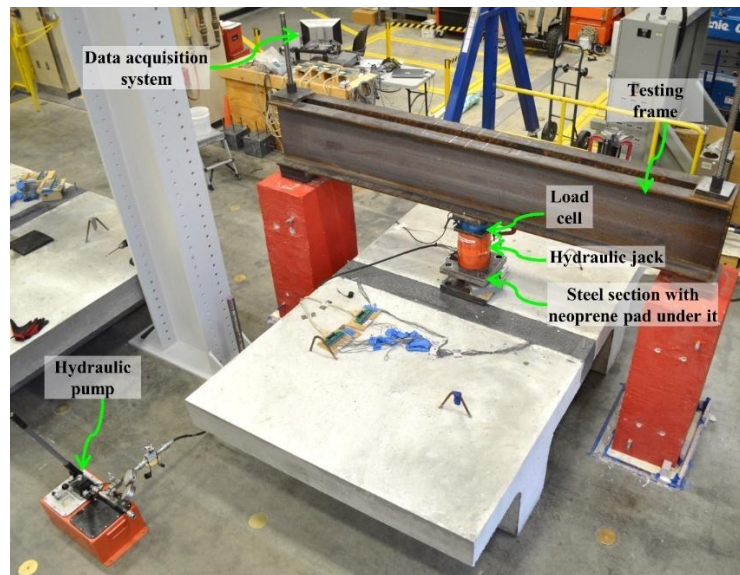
Test setup used for Test D5 of all the double-tee specimens.
